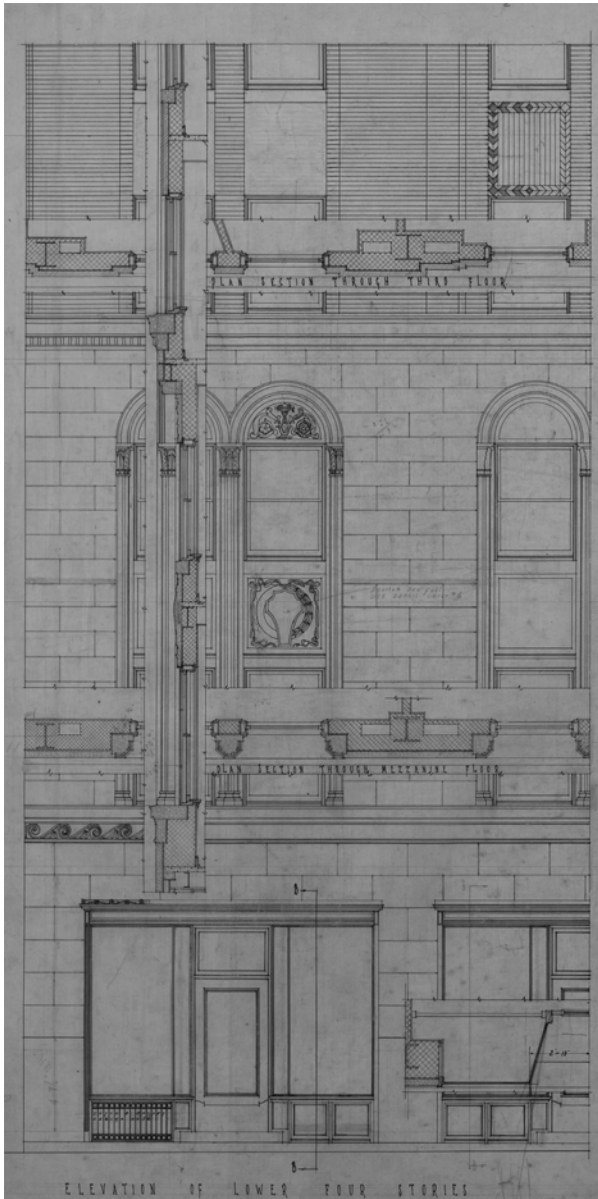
Hutton & Souter, Architects, "Plans of Alterations and Additions for Royal Connaught Hotel Hamilton," 27 Apr. 1931, Souter, Bell, Howard and Souter Fonds, Archives of Ontario, C12-1-0-458, Container # L-717, Barcode B732587, Drawing No. 12 – Elevation of Lower Four Stories & Elevation of Top Three Stories.
